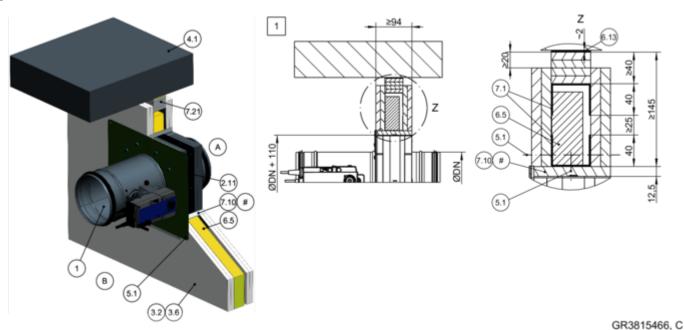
Dry mortarless installation with installation kit TQ2 into a lightweight partition wall, below a flexible ceiling joint
